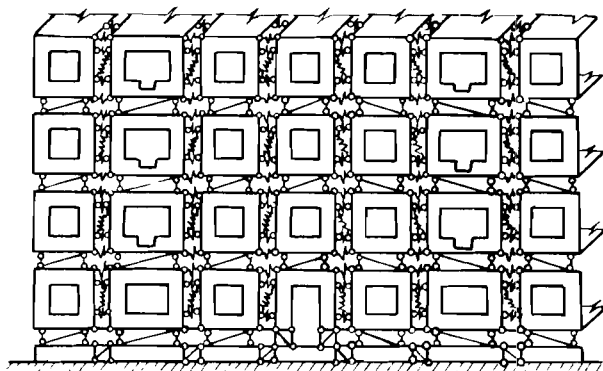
Design diagram of an outer wall of a large-panelled building at bending in plane.
